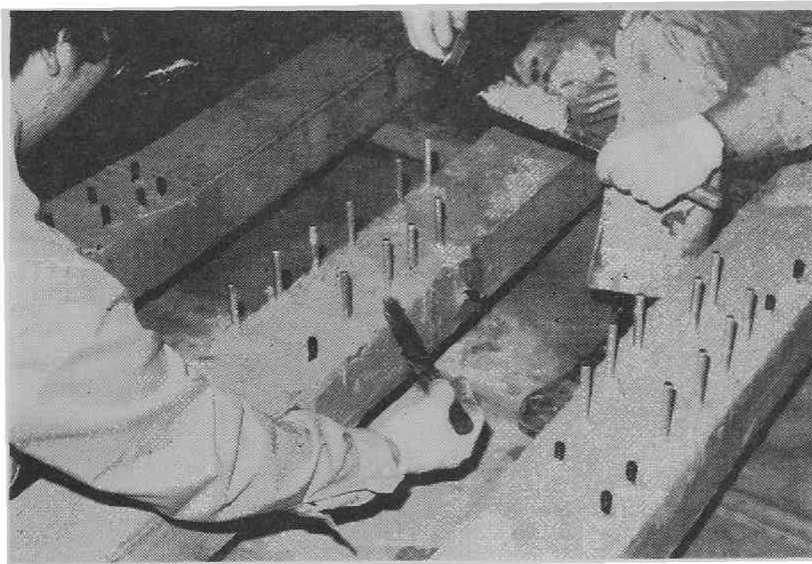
Type I repair: Sealing cracks with epoxy bond.
